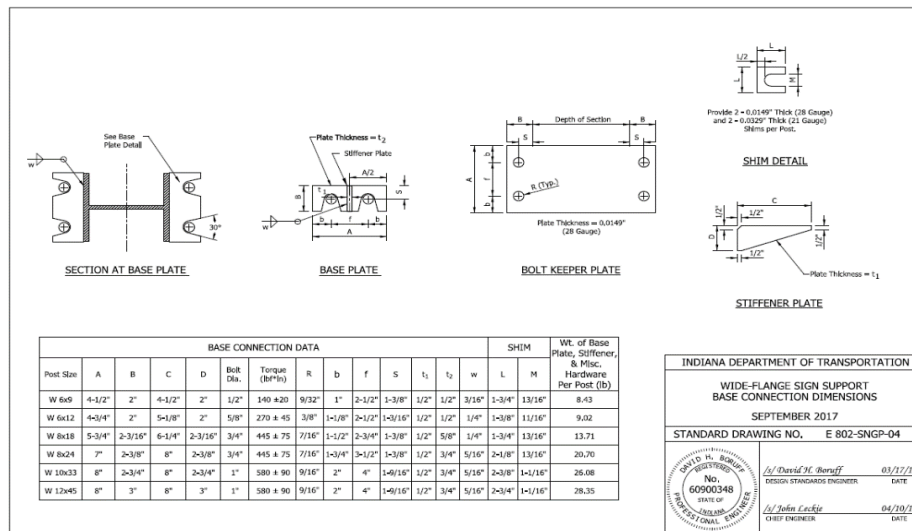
Wide-Flange Sign Support Base Connection Dimensions (E 802-SNGP-04)
